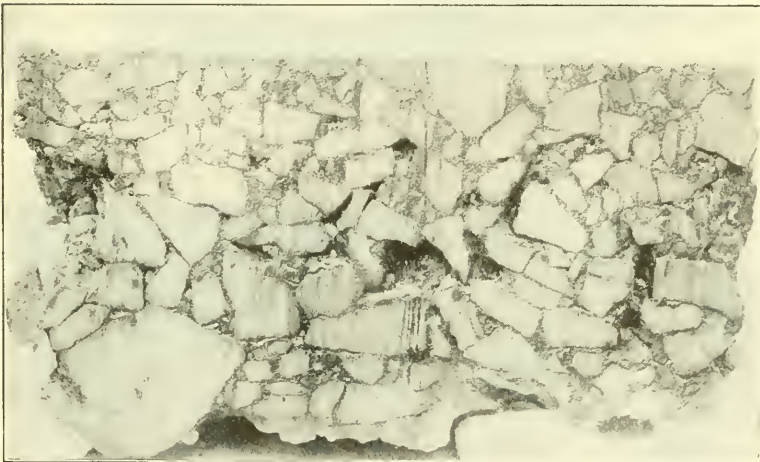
SEC. 5.—BITUMINOUS PAVEMENT, BUILT BY MACHINE-MIXING METHOD.
